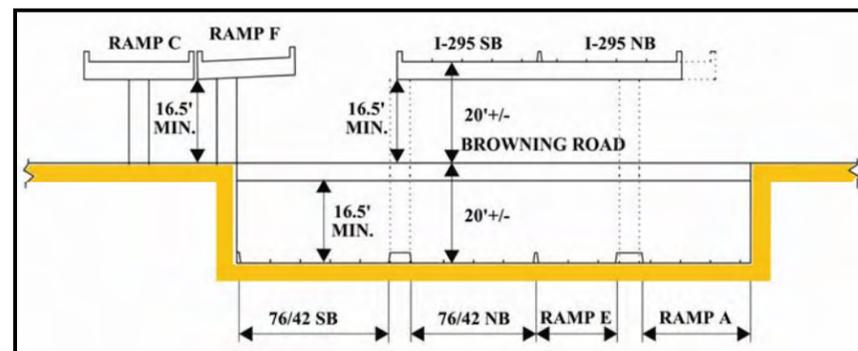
Section A-A at Browning Road (Alternative D)
